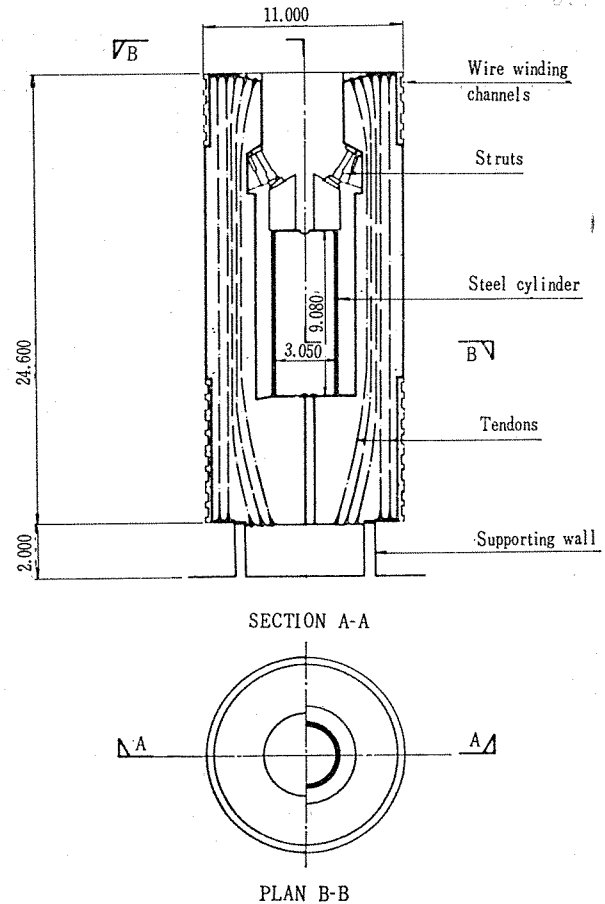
Outline of large fatigue chamber of prestressed concrete and steel<sup>17)</sup>.
